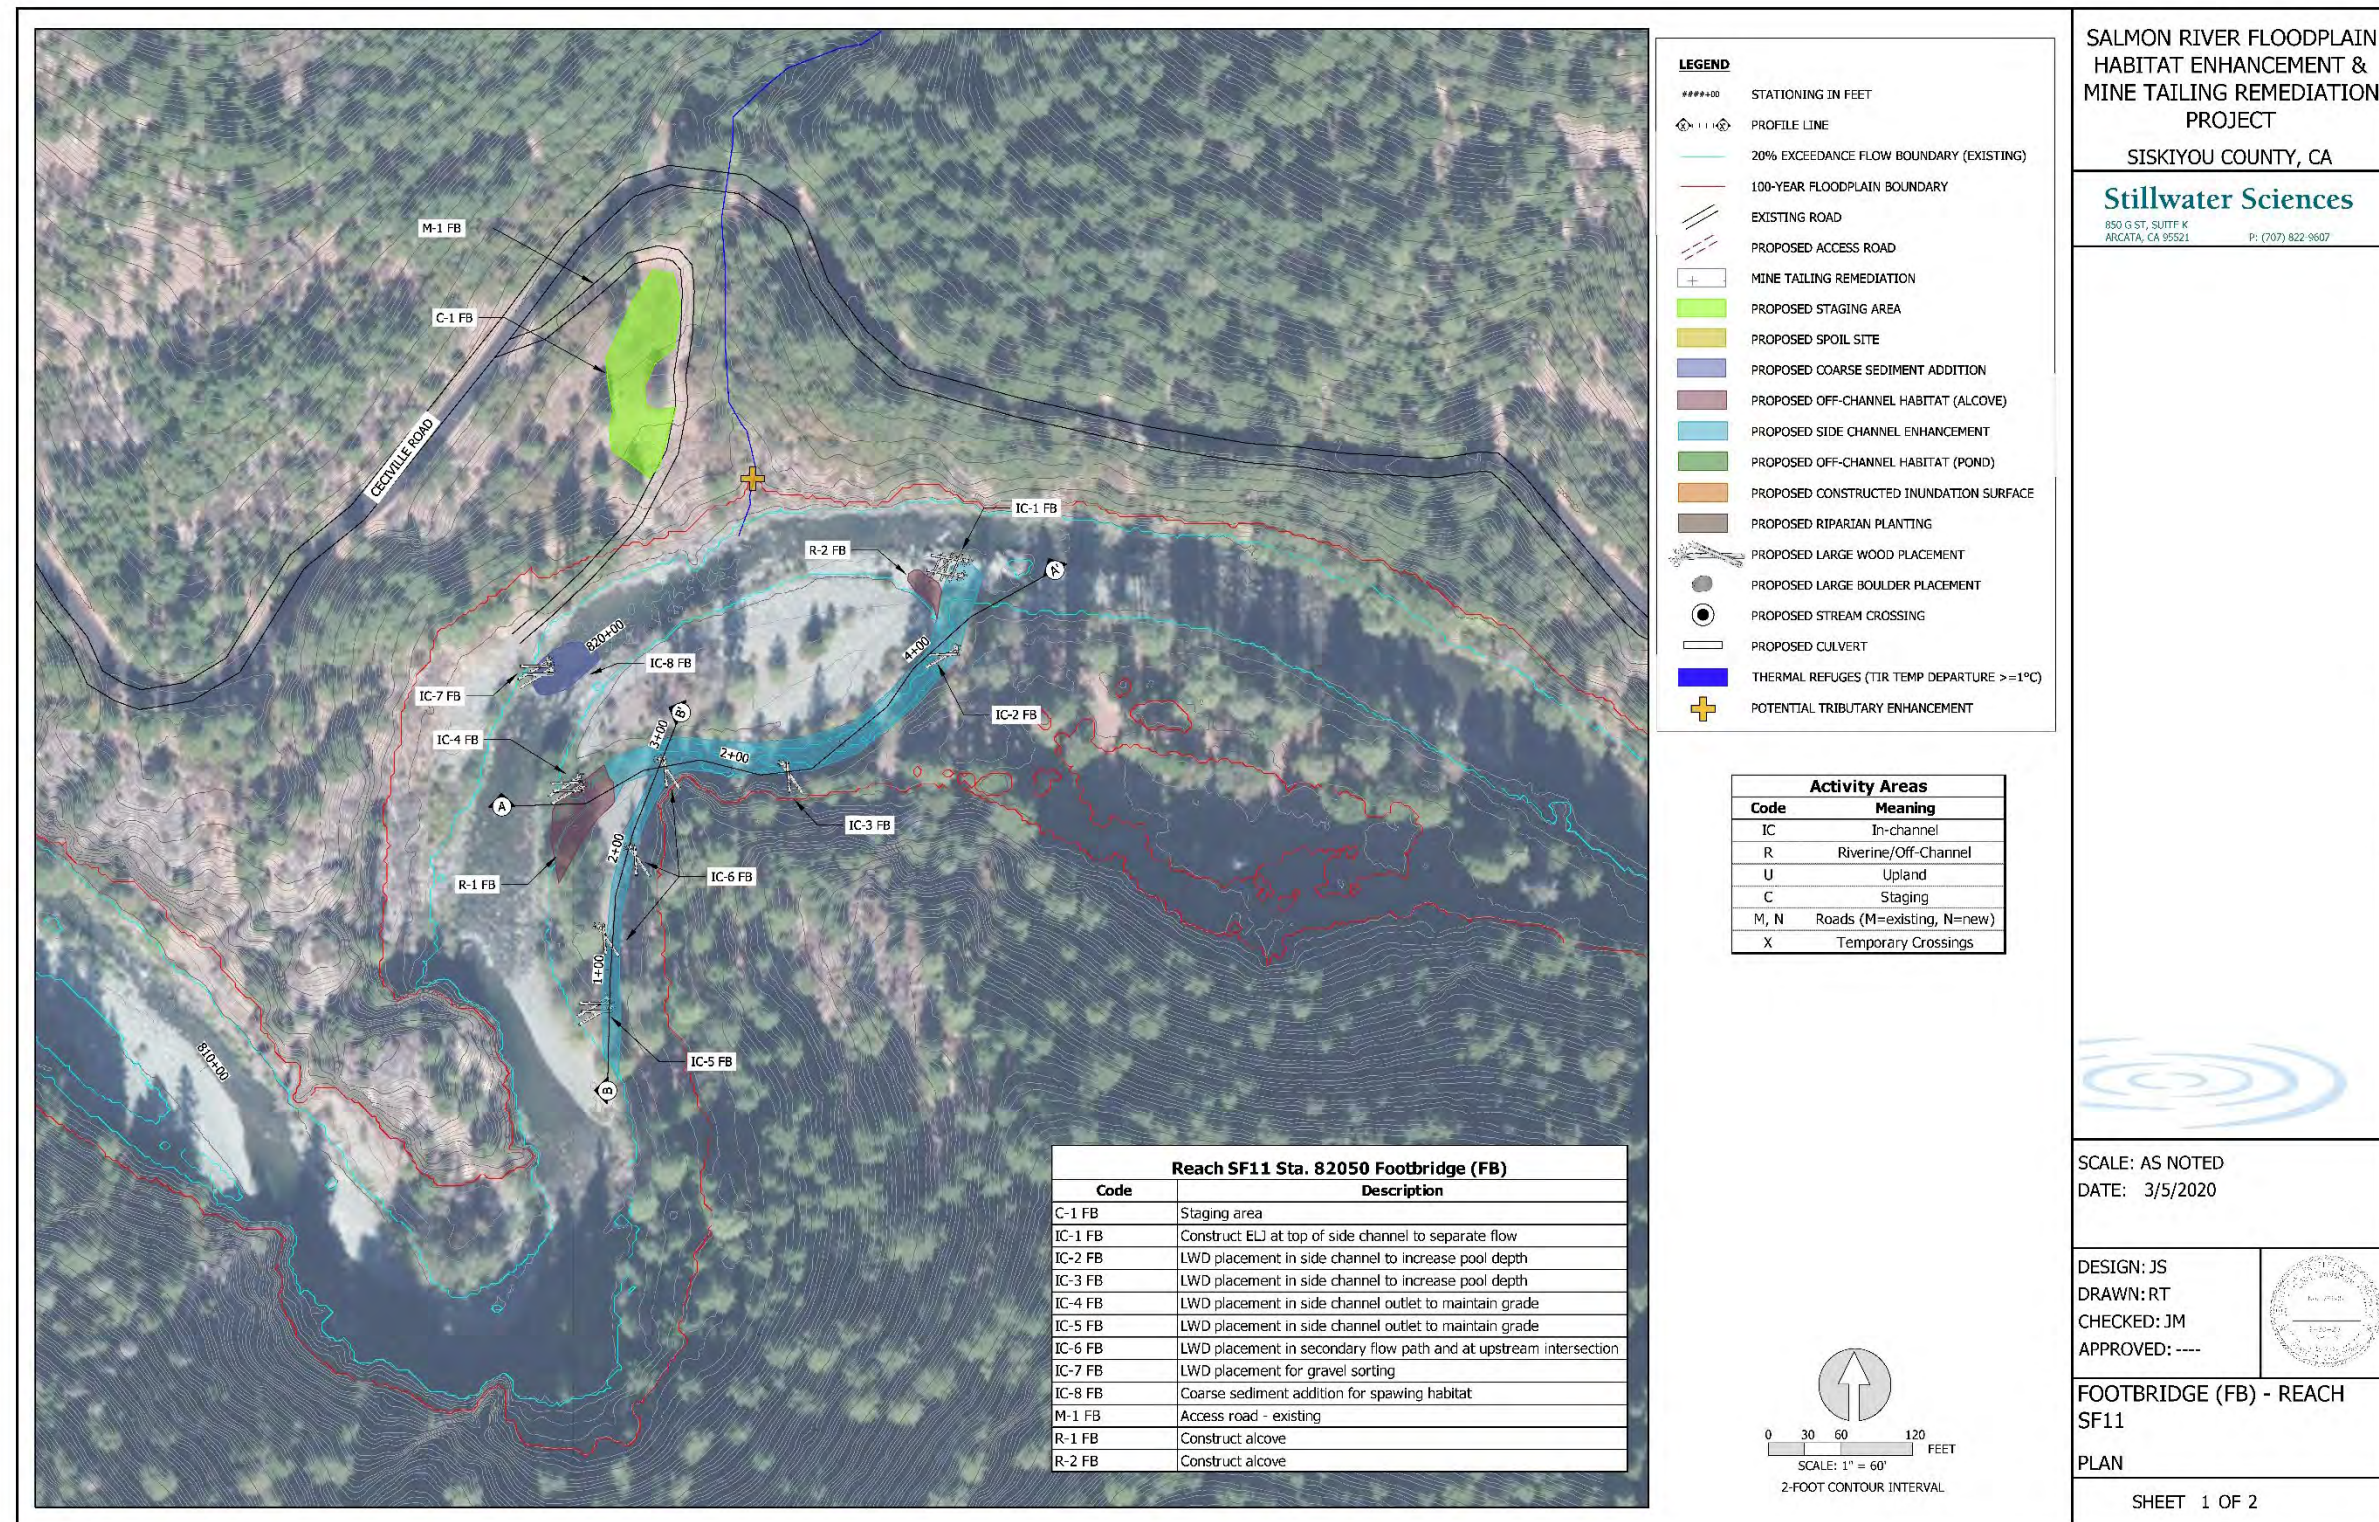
Design plan for South Fork Reach 11 at Footbridge.
